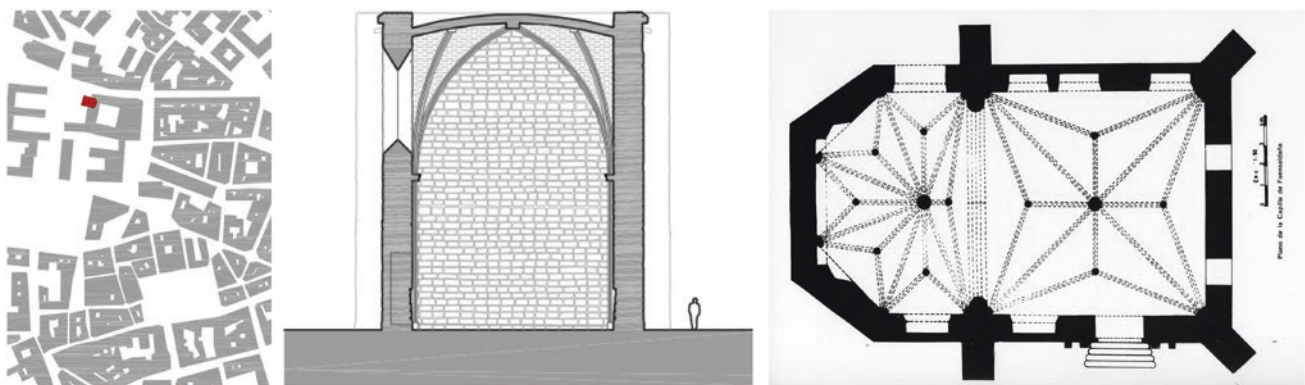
Site plan and section; Author's own, 2013. Plan of the original configuration of the chapel; Rodríguez, 1981
